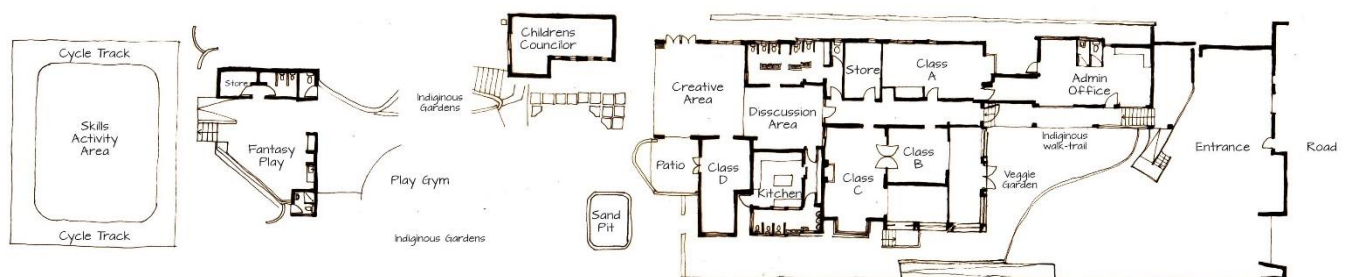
Bellevue Campus Ground Floor Plan (2022)
